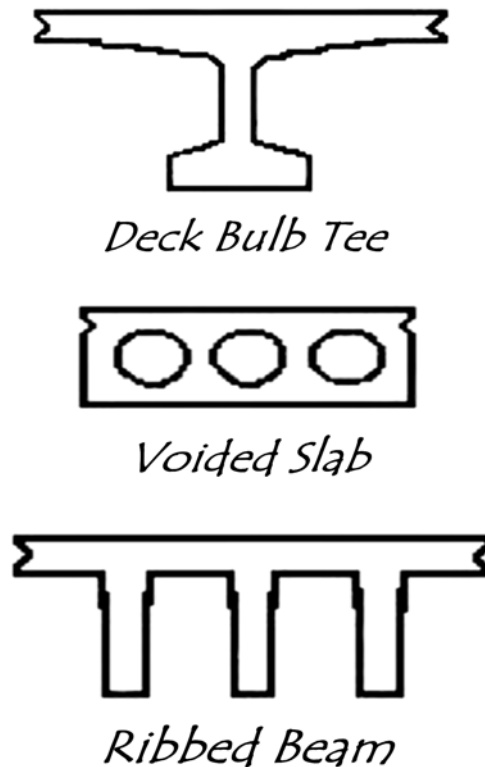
Standard girder cross-sections used by WSDOT (WSBDM 1998)
